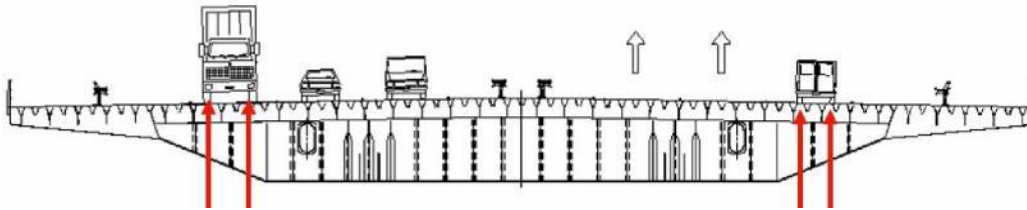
Fatigue cracks on locations of a typical layout of lanes on a steel bridge (Dooren, F. van)
